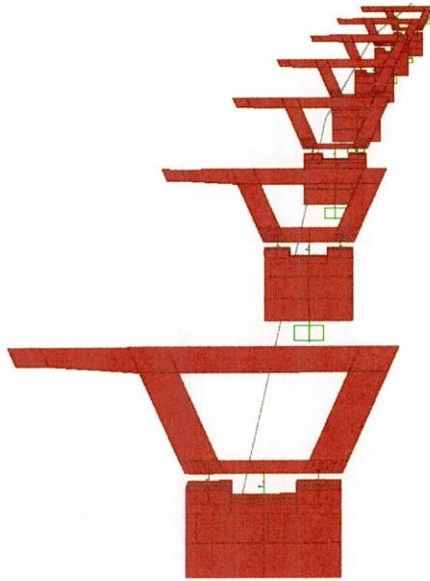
3D View of pier, diaphragm and exterior girder.
